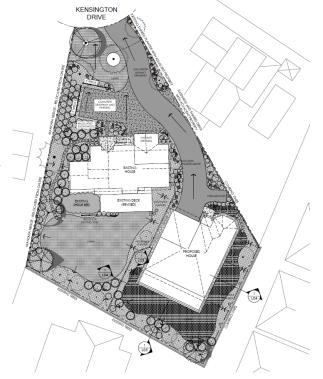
Site Plan showing the location of the second dwelling to the south of the original dwelling. The driveway access is shared.
